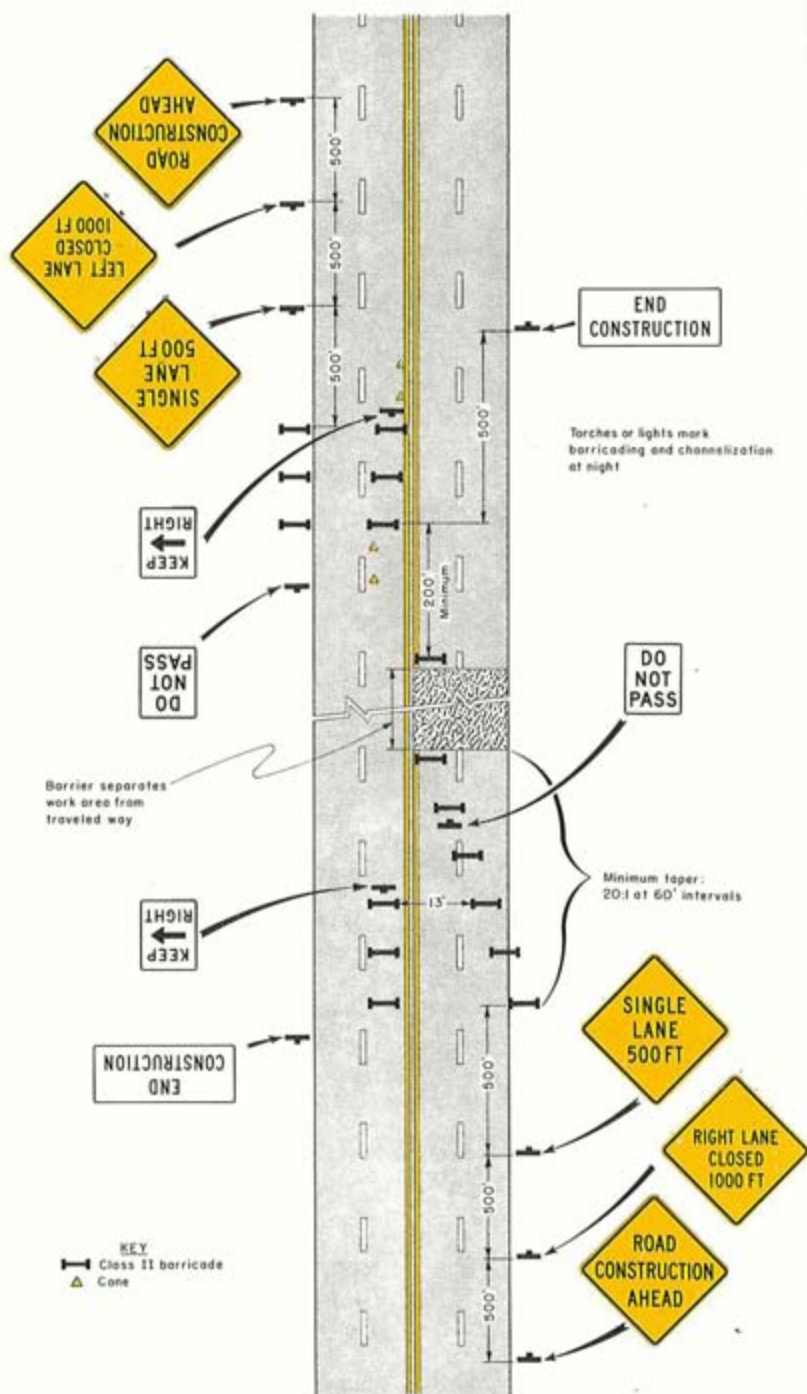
Typical applications of traffic control devices on 4-lane undivided highway where half the roadway is closed.
